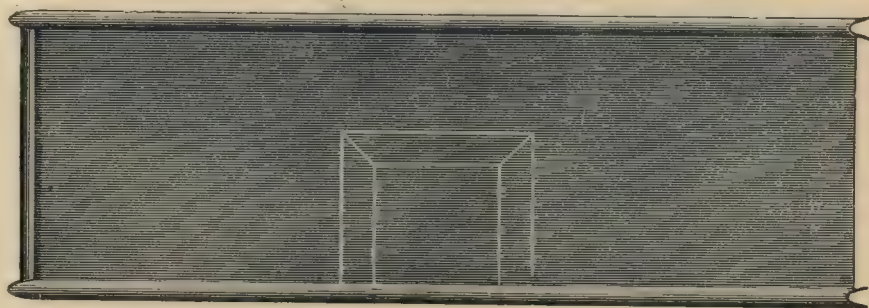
shows an end view of Double Cap Roofing as applied on buildings with Fire Walls on the side, or with Cornice Gutter. Where Tin Gutter is used on a roof with Fire Walls, the upper side of Gutter where the iron connects, should be 20 to 40 inches above the center, or where the water flows, according to quantity of water the Gutter is calculated to carry. Better have the Gutter in such a roof *too large than too small*. In cornice gutters have upper side of tin gutter where iron hooks on, higher than the outside of cornice.
